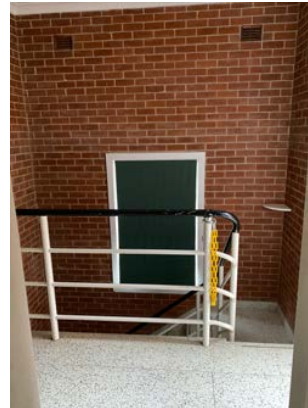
Walkway leading to the first floor rear verandah. (21.5.2020)
